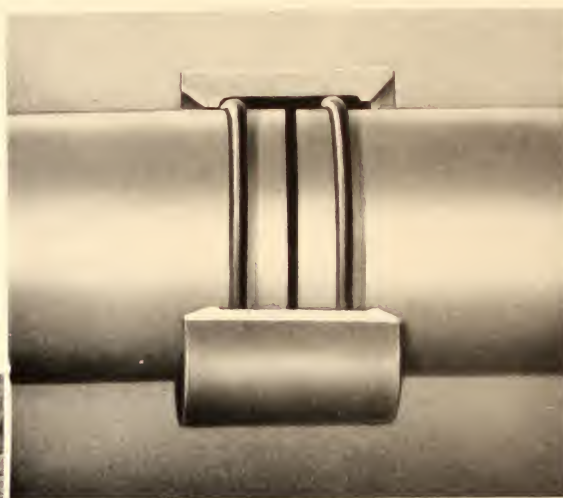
SIMPLEX JOINT SECTIONED TO SHOW RUBBER RINGS IN POSITION.
